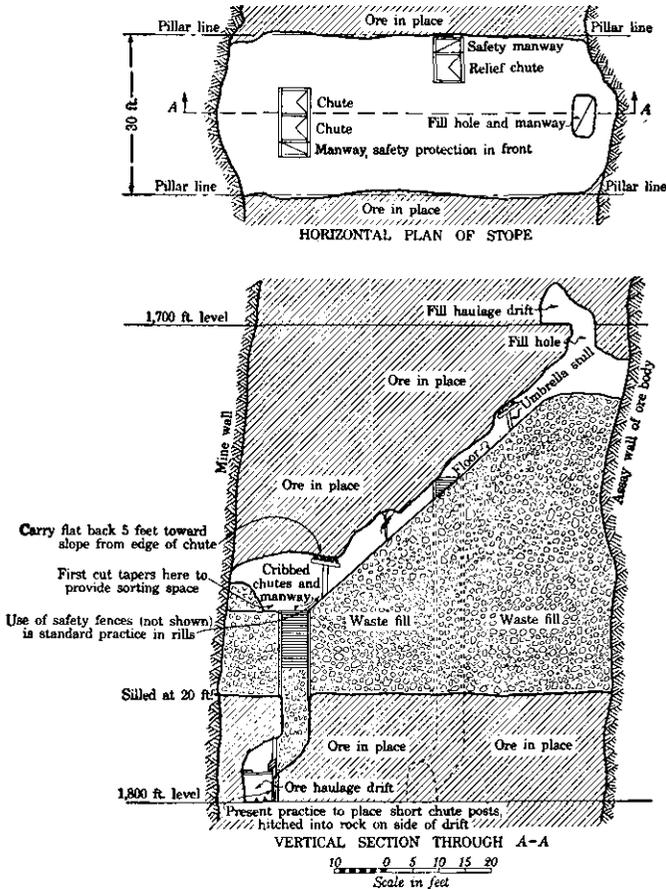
Typical rill section. Inclined cut-and-fill stoping
